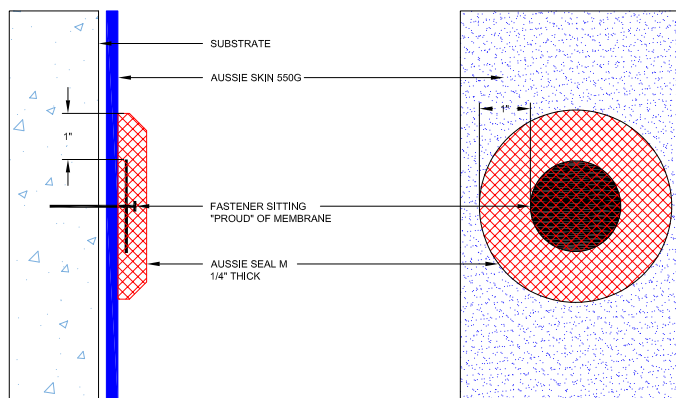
NON-FLUSH FASTENER DETAIL
